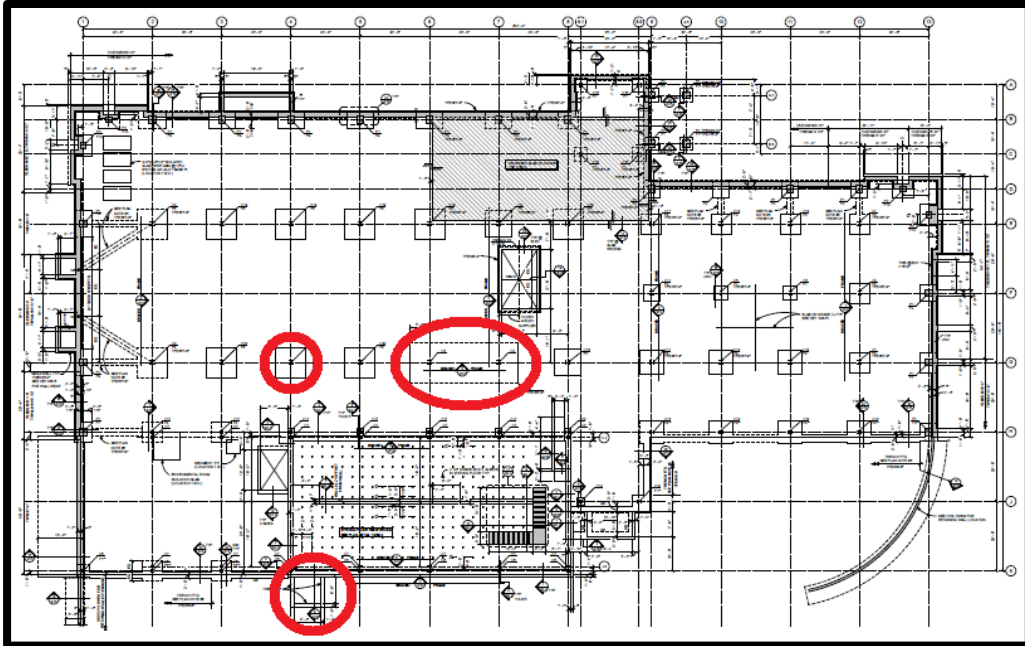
DLC Building Foundation Plan Showing Earth Pressure Cell Locations
